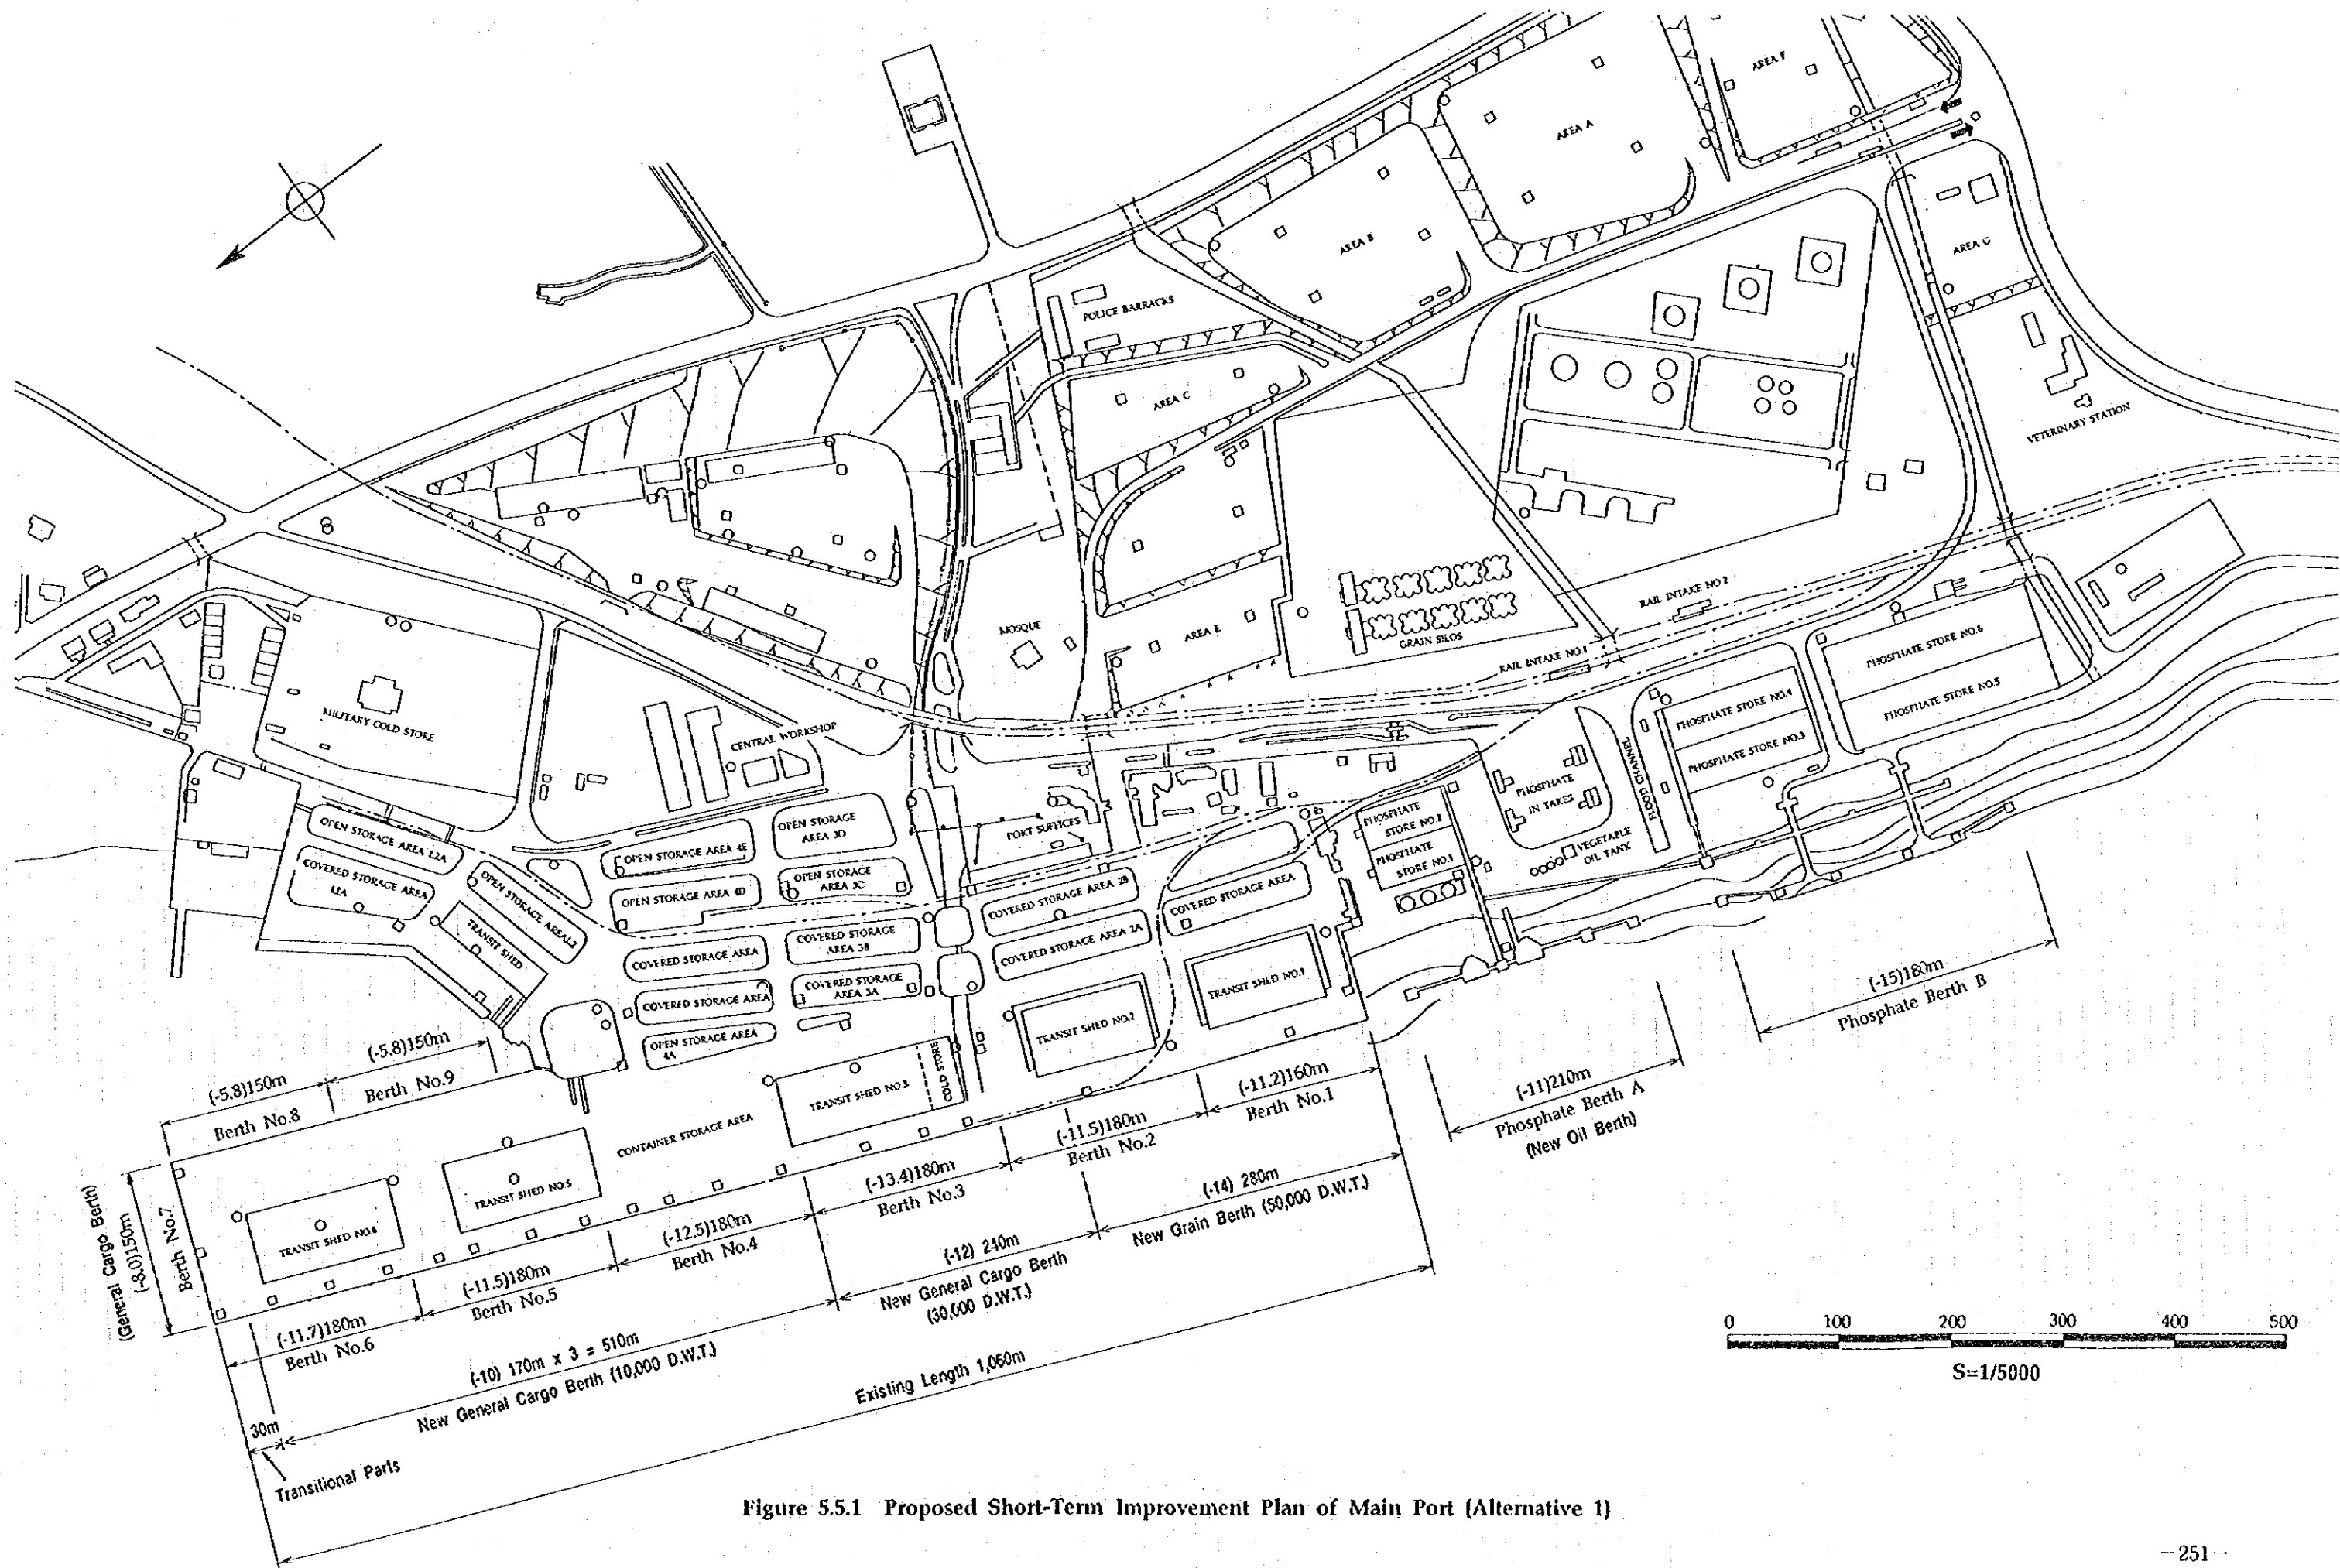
Proposed Short-Term Improvement Plan of Main Port (Alternative 1)
